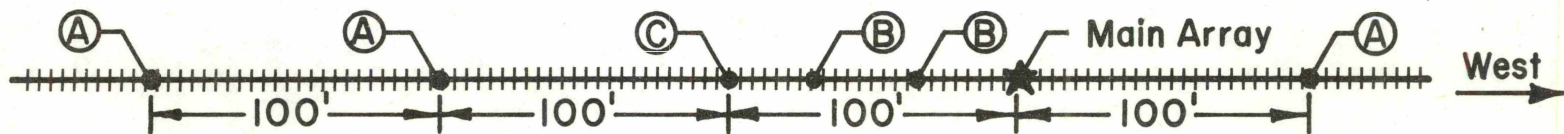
INSTRUMENTATION LAYOUT FOR TIE TRACK SECTIONS
